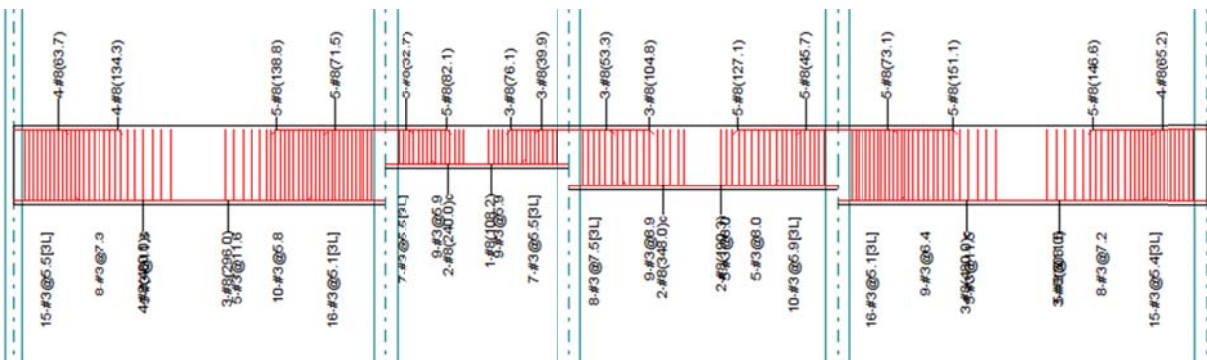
spBeam Column Line K Reinforcing Diagram (Lateral Loads)
